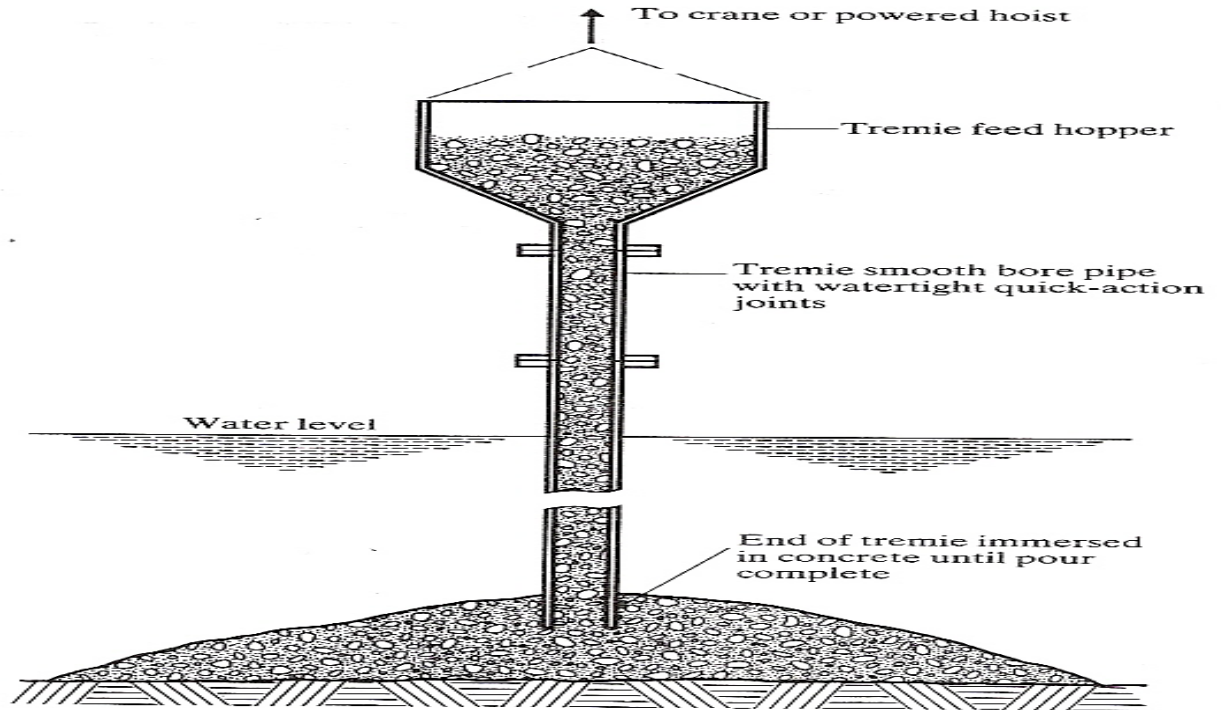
Underwater Concreting (based on Concrete Society, Underwater concreting, technical Report, No. 3, pp. 13, London, 1971)
